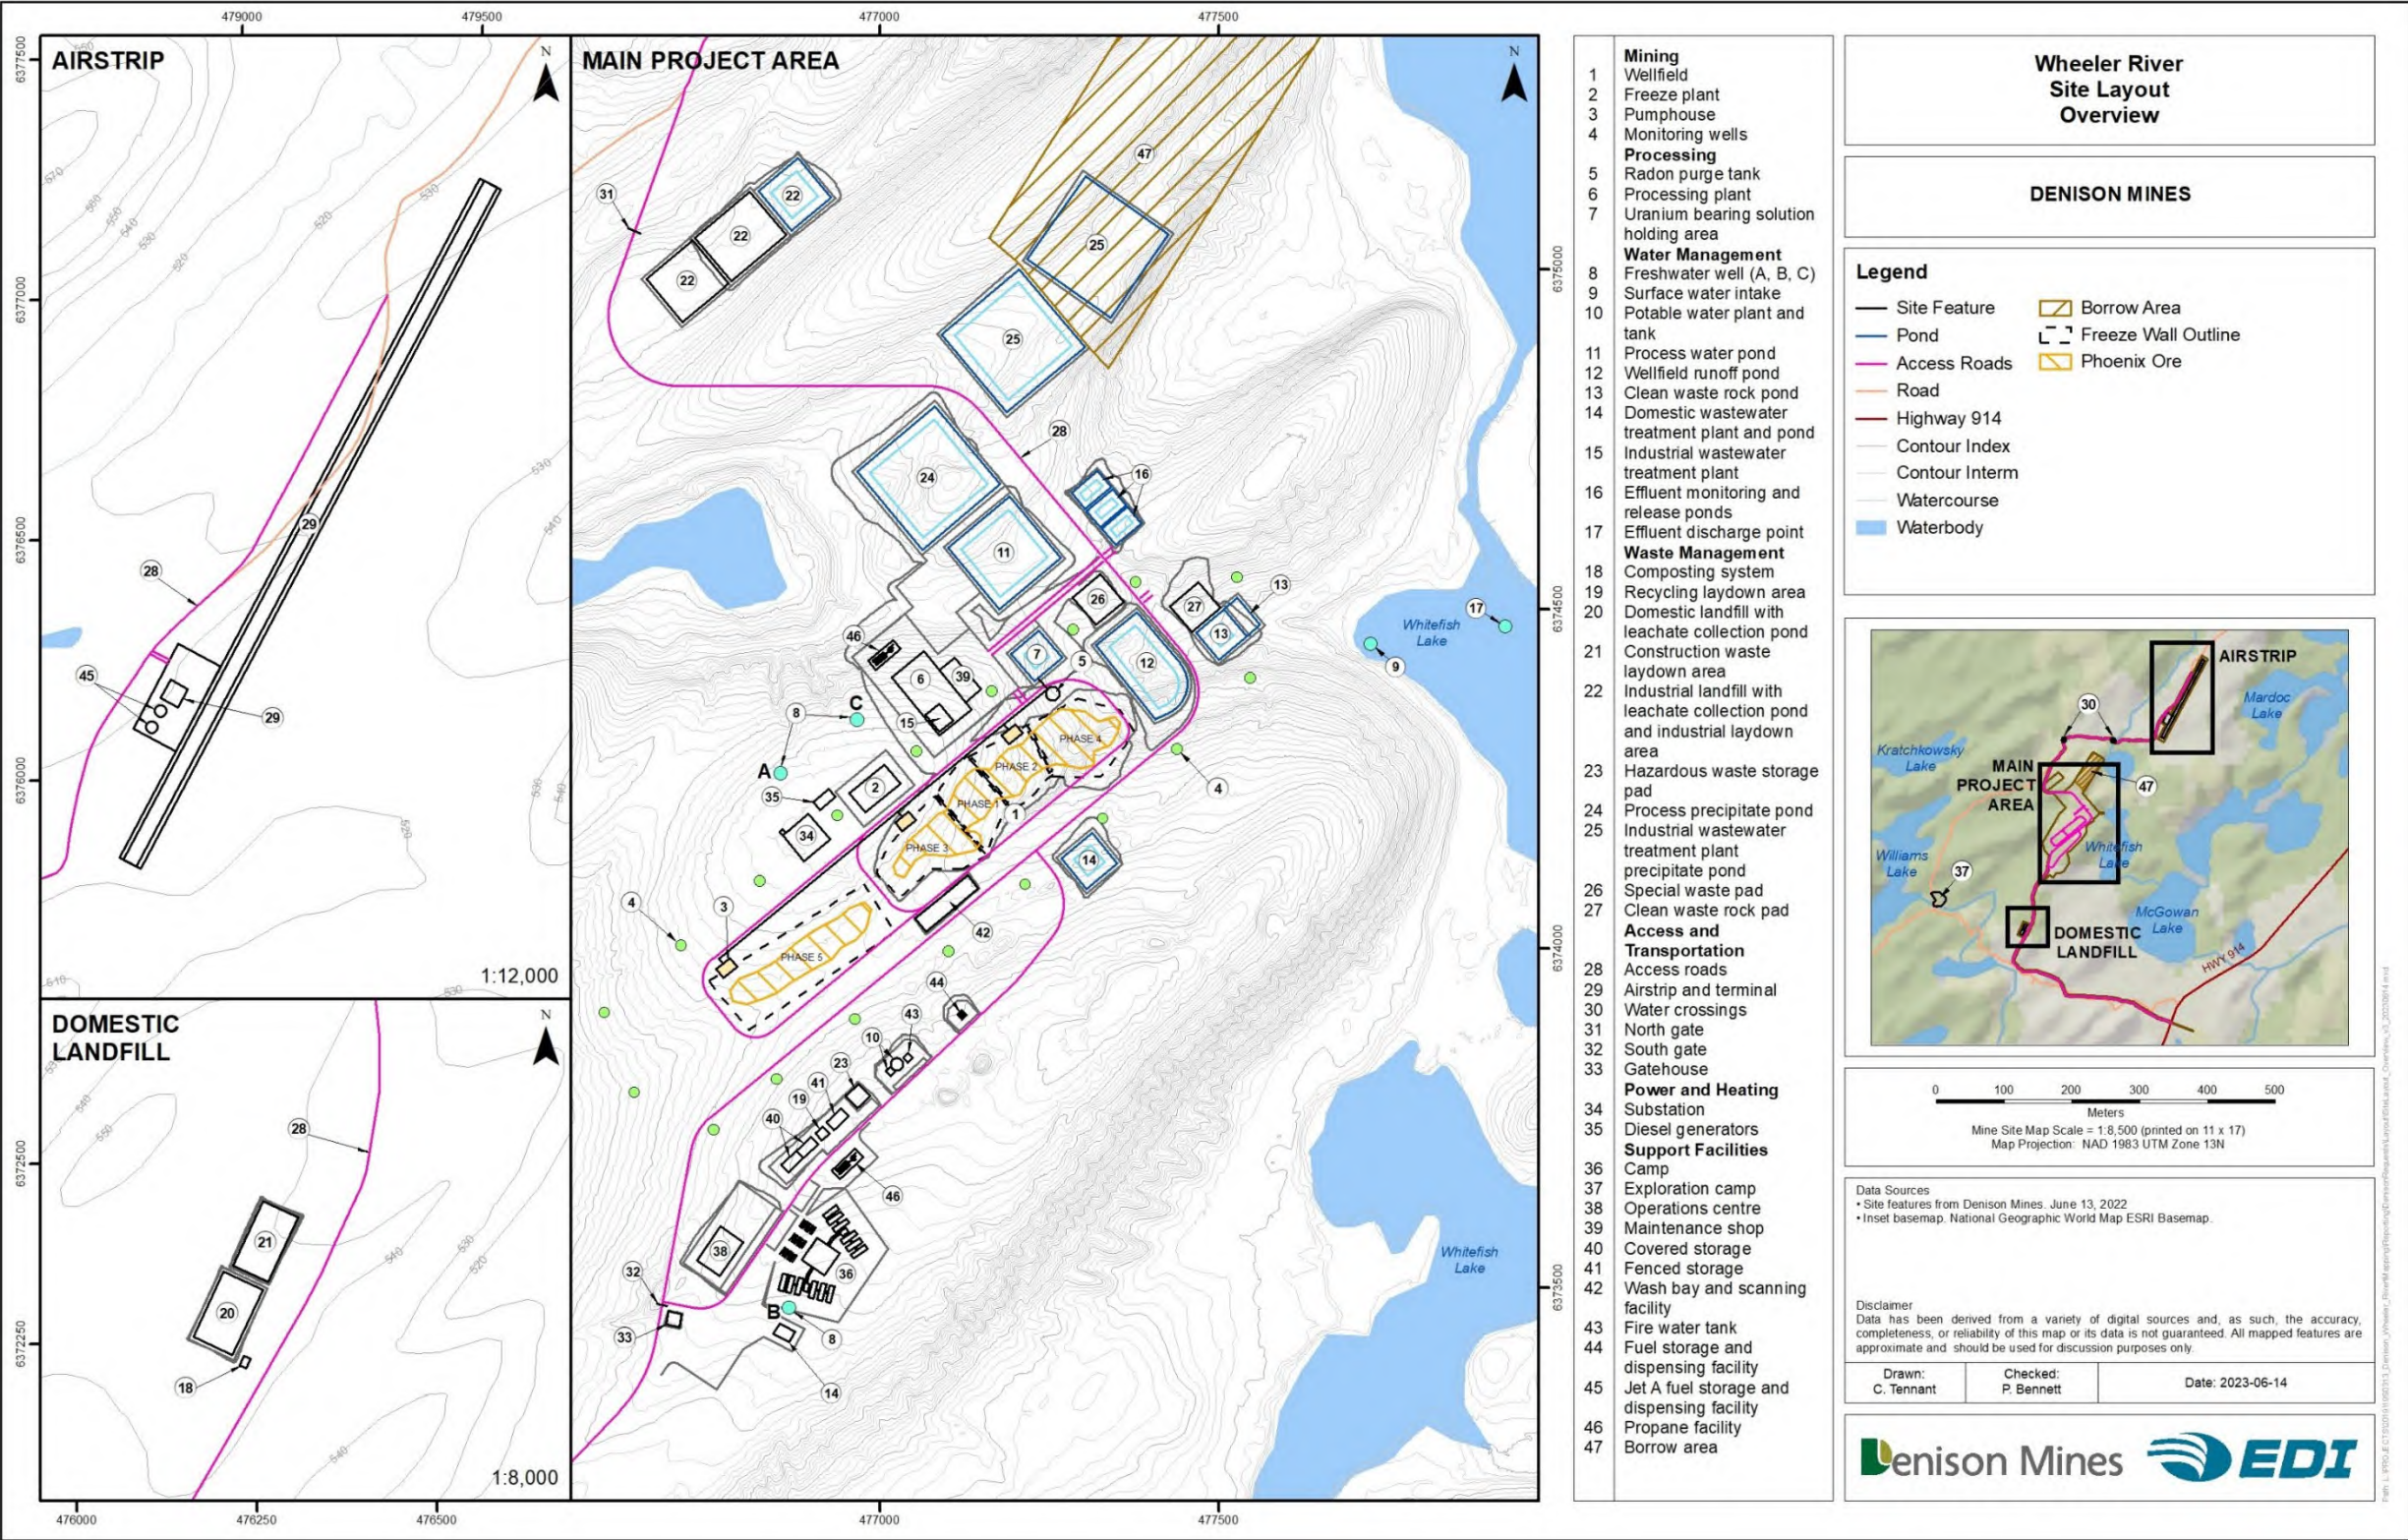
Wheeler River Project Proposed Site Layout
